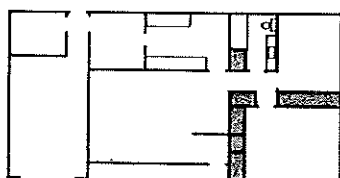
Floor plan of a two-bedroom house. 28'-0" x 56'-0".
